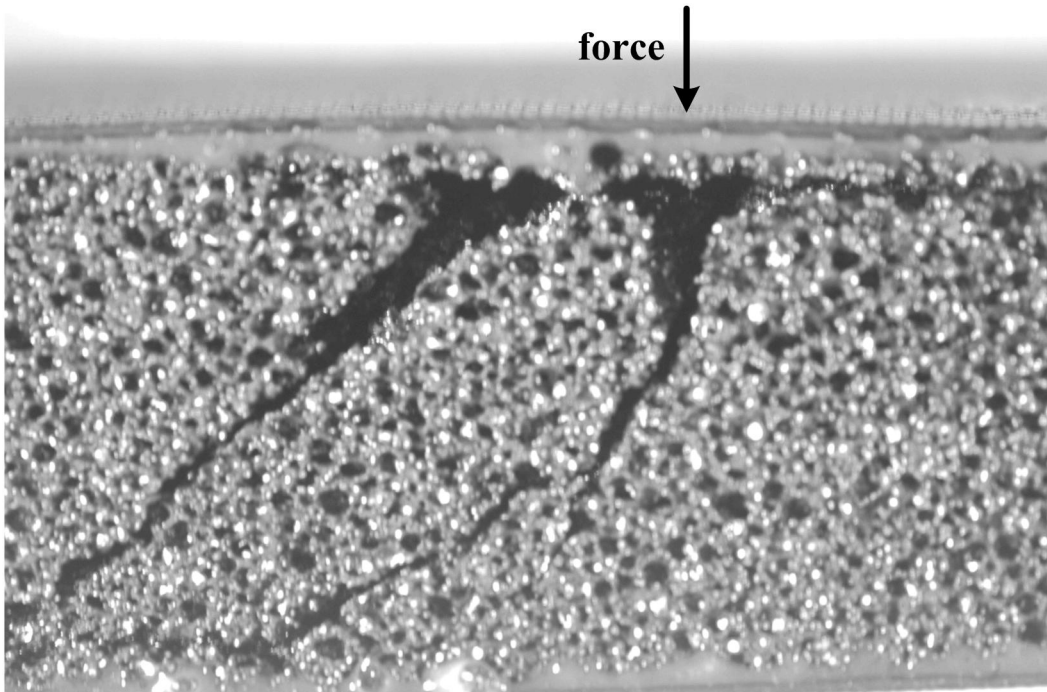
Crushing Failure Due to Transverse Compressive Stress (Specimen 7)
